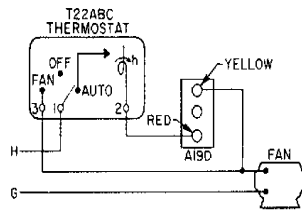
Wiring the A19D as a low cutout unit heater control.
